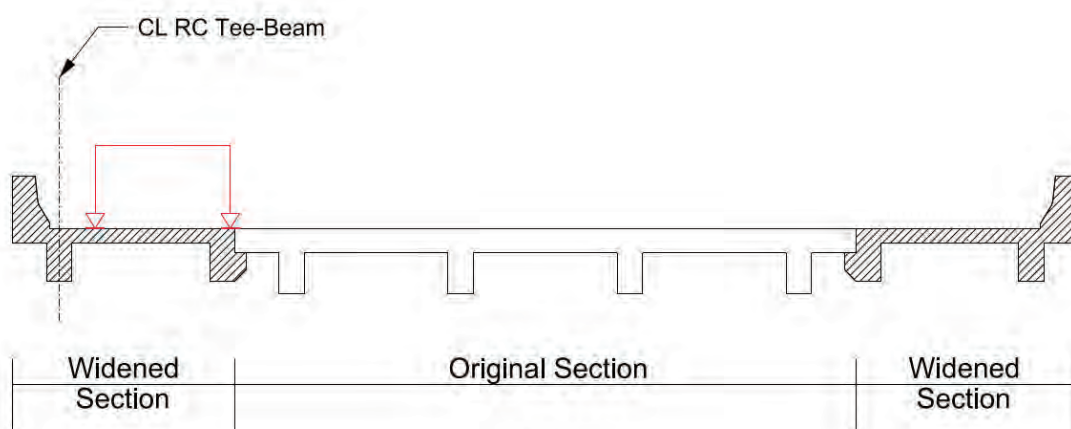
Representative Exterior RC Tee-Beam Test Truck Location
